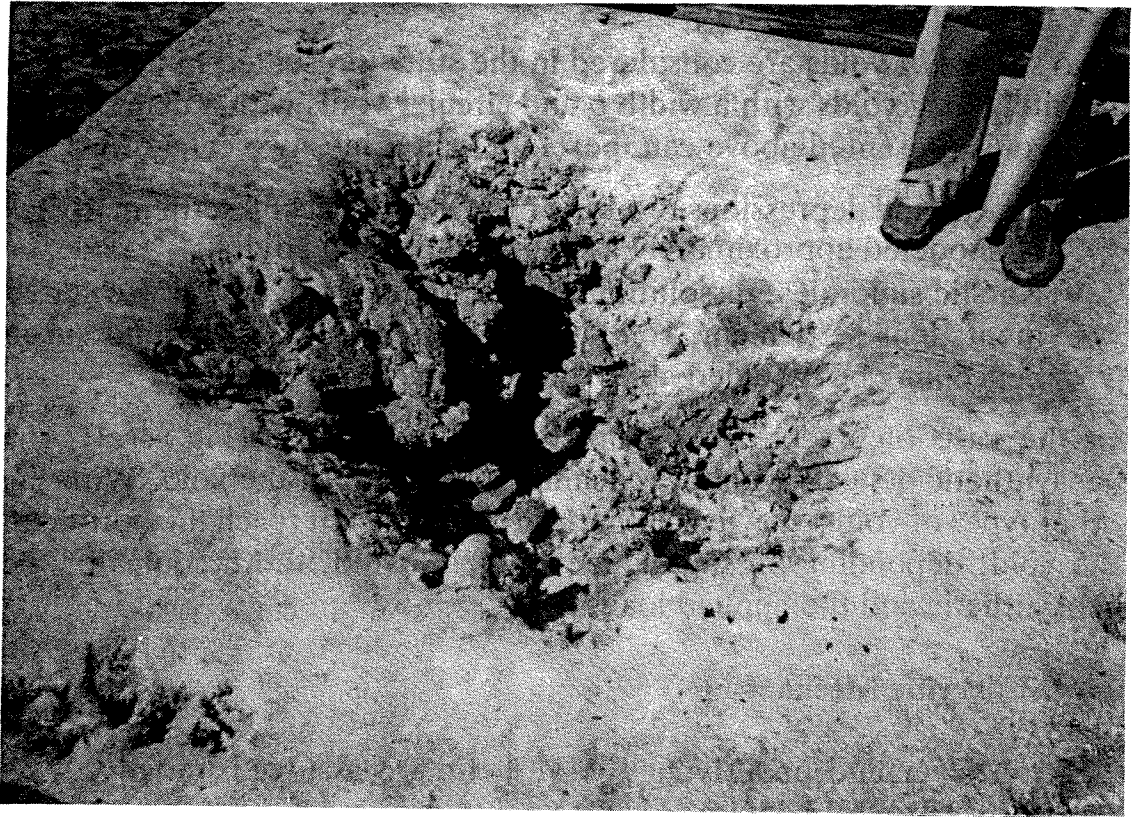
Dissolution Cavity. This cavity in high gypsum content soil was caused by water leaking through a concrete canal liner.
